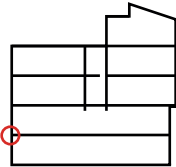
BALCONY/FLOOR, 1ST FLOOR
